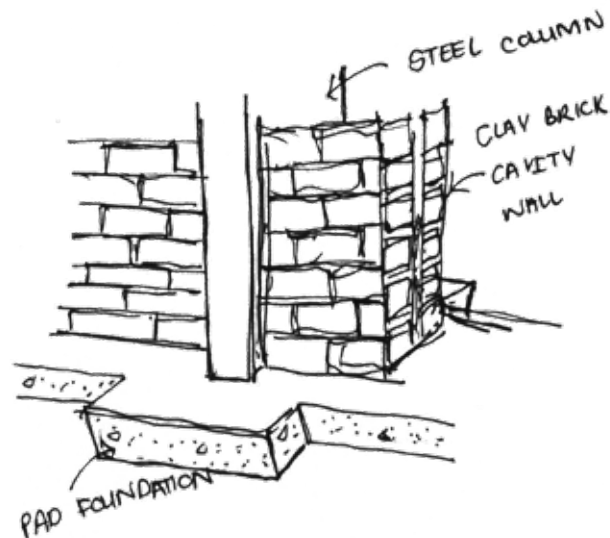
Steel column with clay brick infill detail (Caldeira, 2019: drawing).
